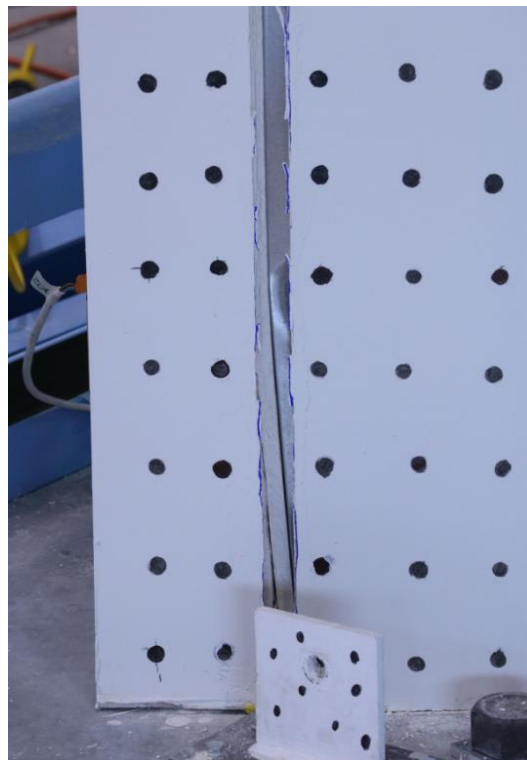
Specimen B1 – Step 14 – DS2a & 3: Wallboard damage to internal plasterboard packing strips and buckling of vertical steel tracks – location 6
